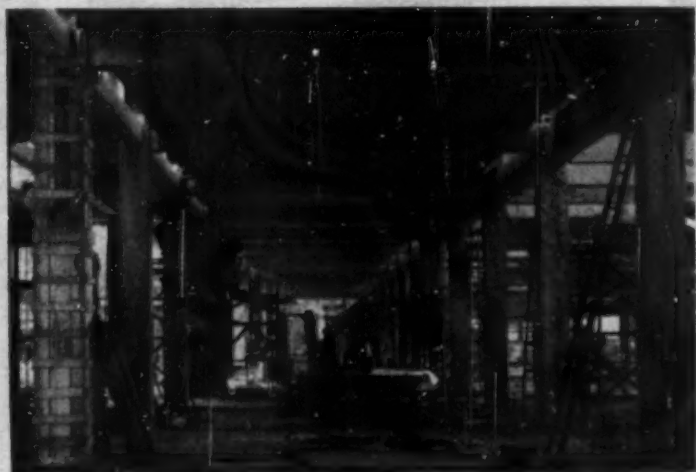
Encased Steelwork supporting Prestressed Concrete Floors.
